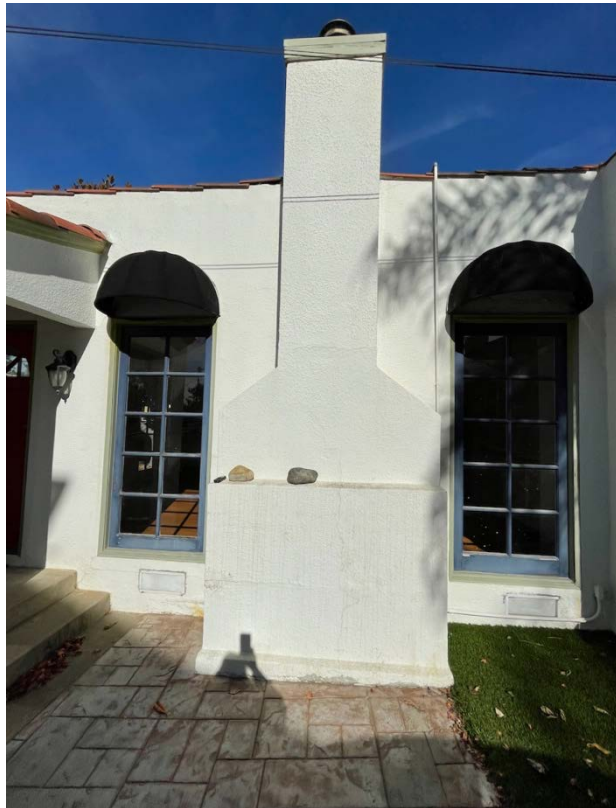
Side (southwest) elevation, chimney flanked with windows (Source: Site visit, December 5, 2023.)
